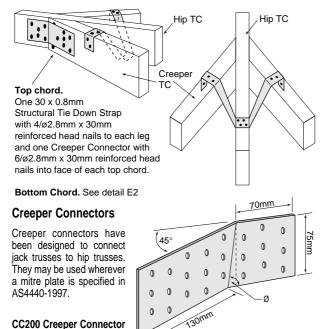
Extended Jack or Hip Truss to top chord of Truncated Standard Trusses
